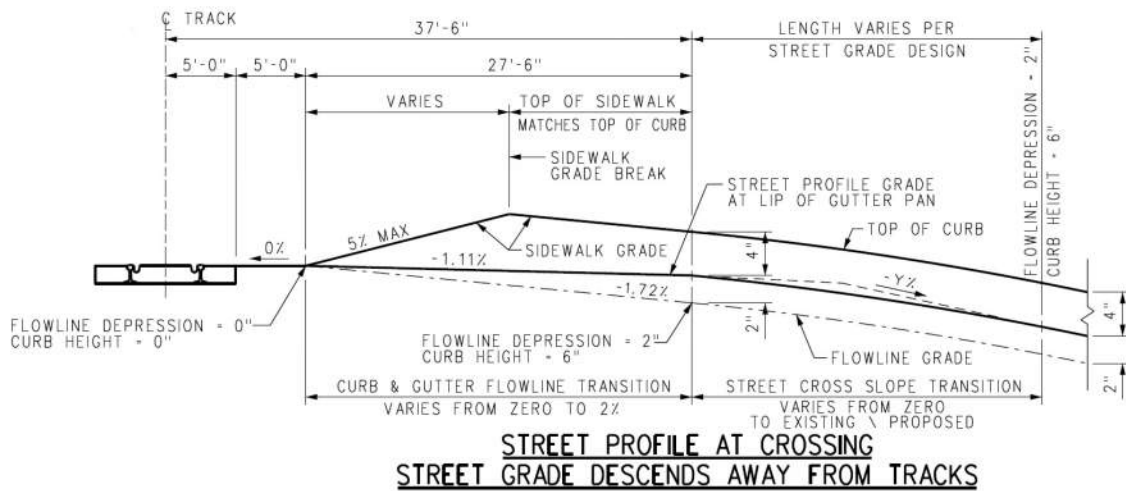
Highway Profile at Highway-Rail Grade Crossing
